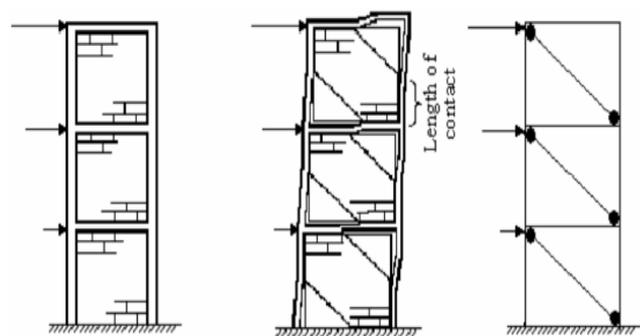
a) Infilled Frame b) Deformed Frame c) Equivalent Strut Model
